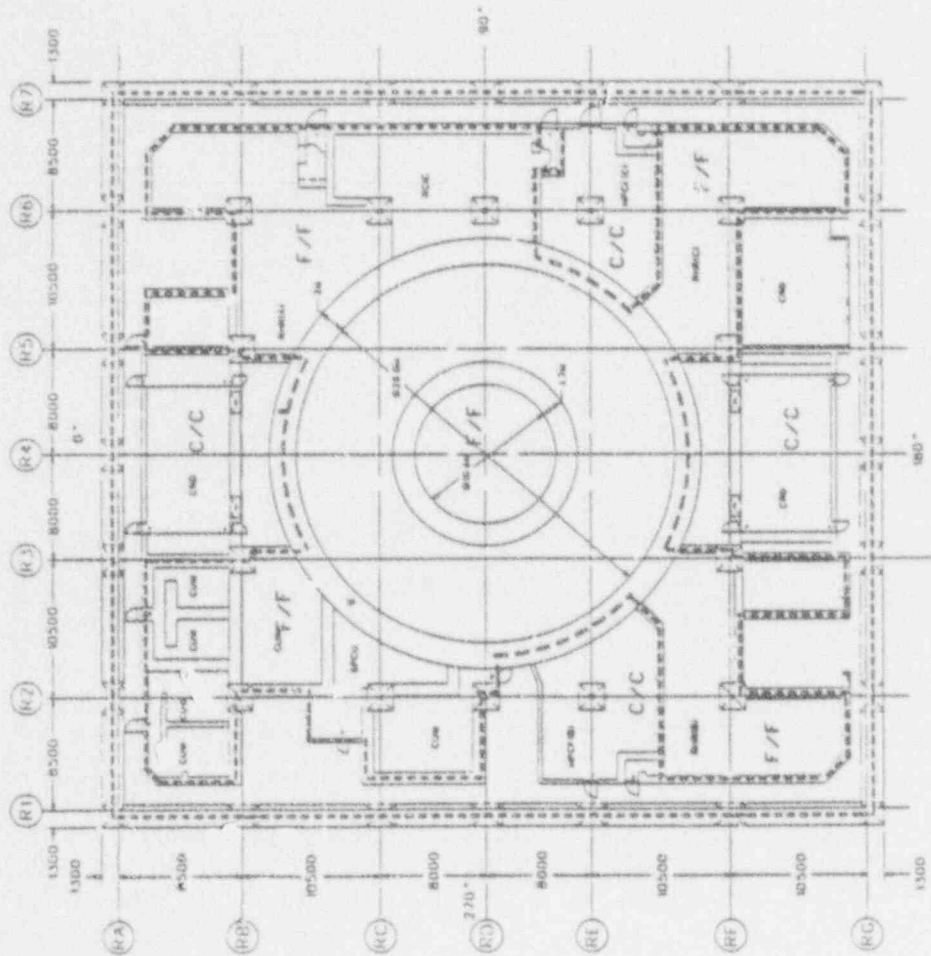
FLOOR PLAN FOR 1000 BRCG
